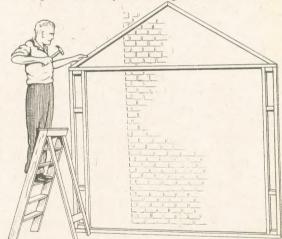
Nailing in 4ft. 10in. angle pieces to front
